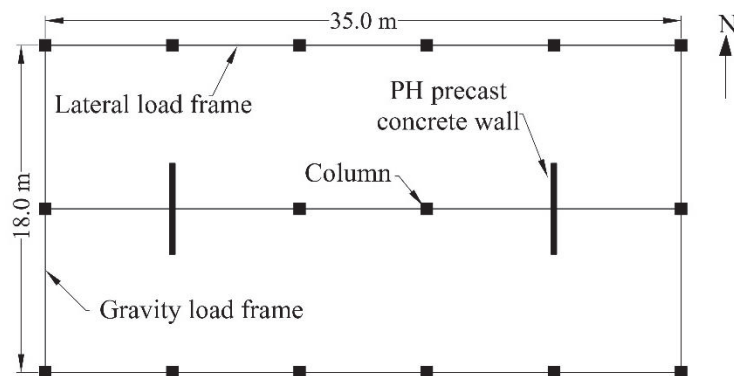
Plan view of archetype post-tensioned hybrid precast concrete wall buildings.
